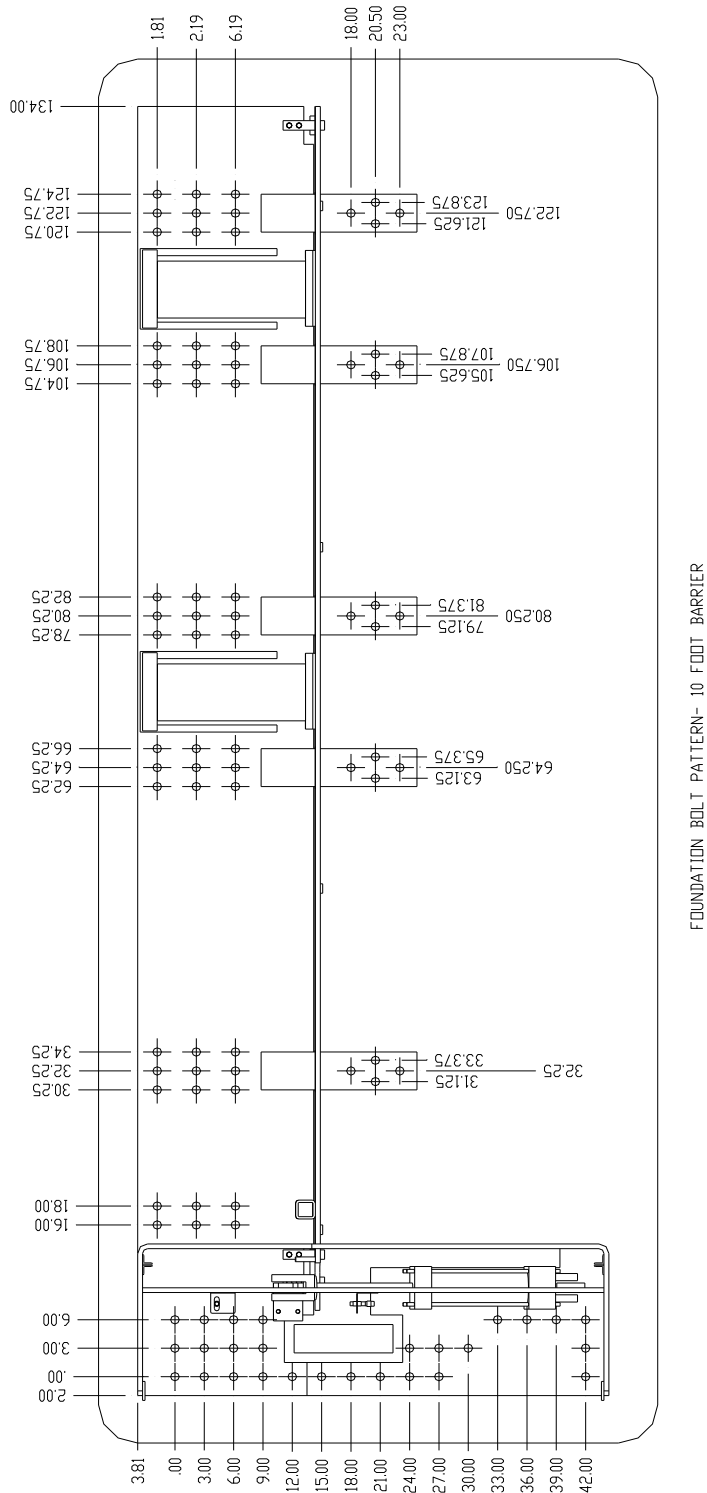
Model 890 Surface Mounted Barrier Bolt Pattern
